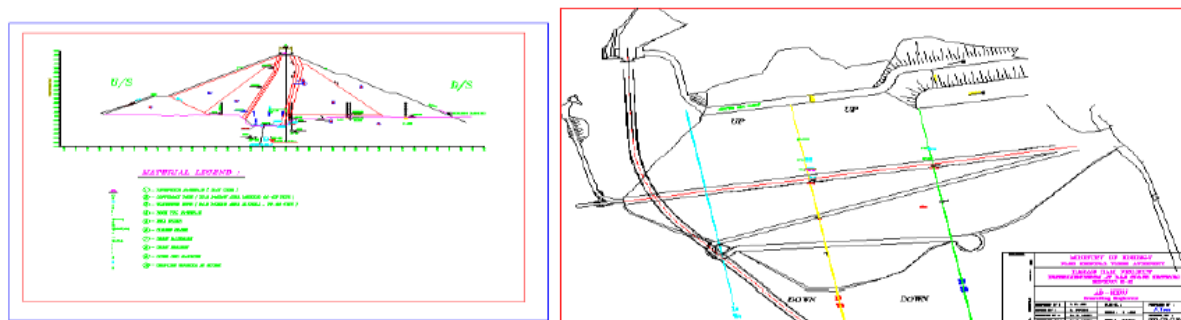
Instrumentation layout plan of Darab Izadkhash dam and its section
